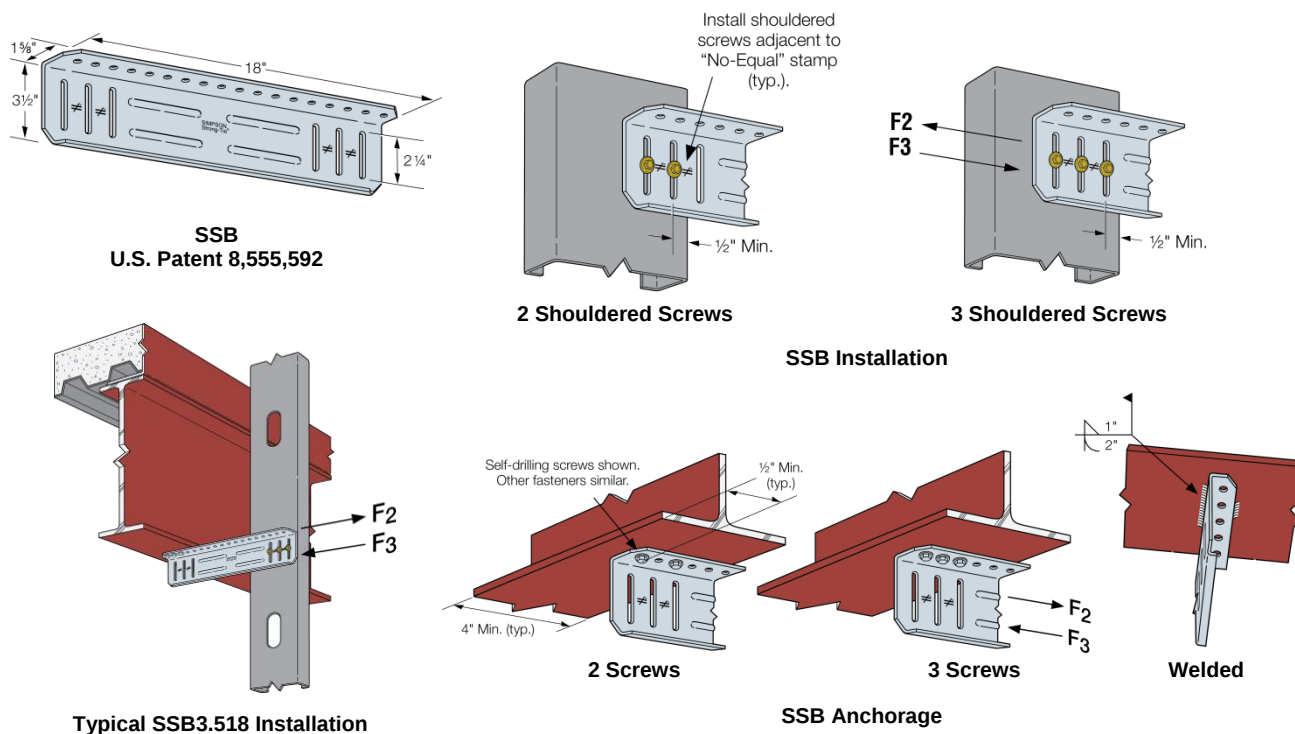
SSB3.518 BYPASS SLIDE-CLIP CONNECTOR AND INSTALLATION DETAILS
